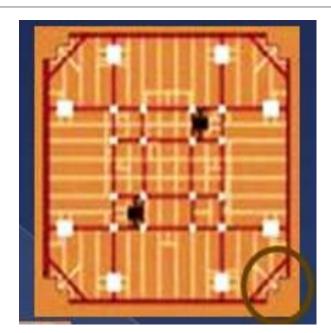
The four W shaped corners for Wind tackle Source: www.taipei-101.com.tw/en/building.aspx#SCROLL2
